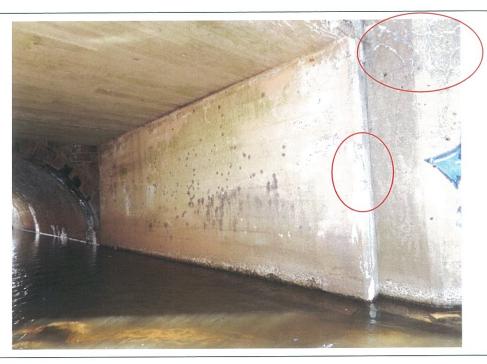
General view of the east abutment breastwall of concrete slab, looking northeast. Note fine cracks with efflorescence at top of the southeast wingwall. Note also, small spall with heavy efflorescence along the south edge, approximately located at mid height of the breastwall.
